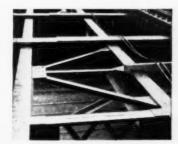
Rusted-out Braces originally riveted to flanges of bridge girders are cut out quickly with torch
